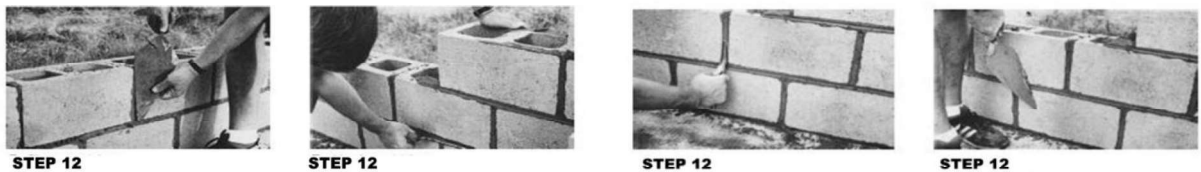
Concrete Masonry Units Steps. Source: CMA (2007)
